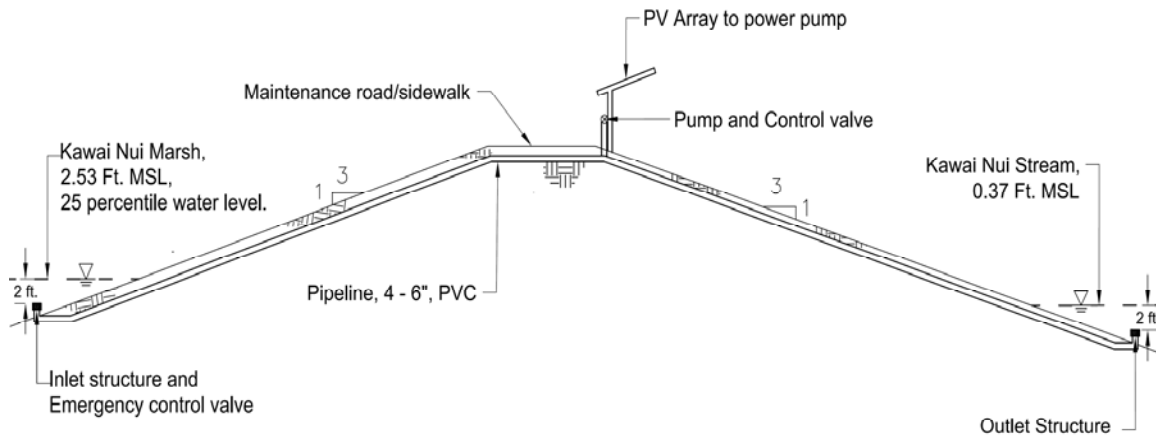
Alt D2, Pump Controlled Pipe Through Levee Floodwall.
